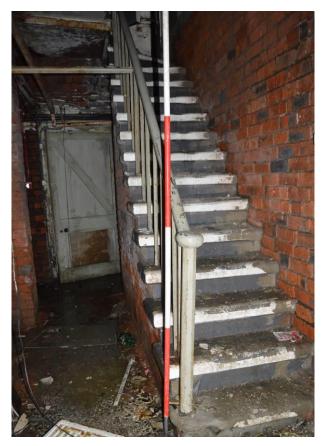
Stairs to basement. Scale 2m. Facing south west.
